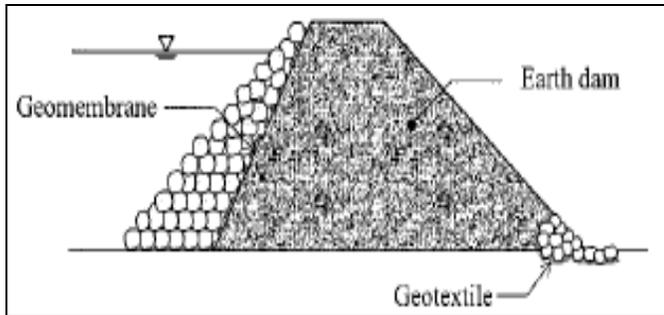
(A): Geomembrane Waterproofing of Earth or Earth-Rock Dam Face
